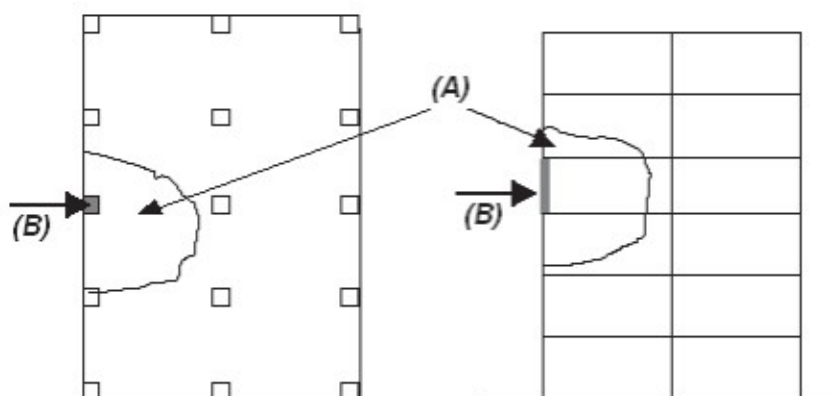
Recommended limit of permissible damage where (A) is the damaged area and (B) is the removed element [9]
